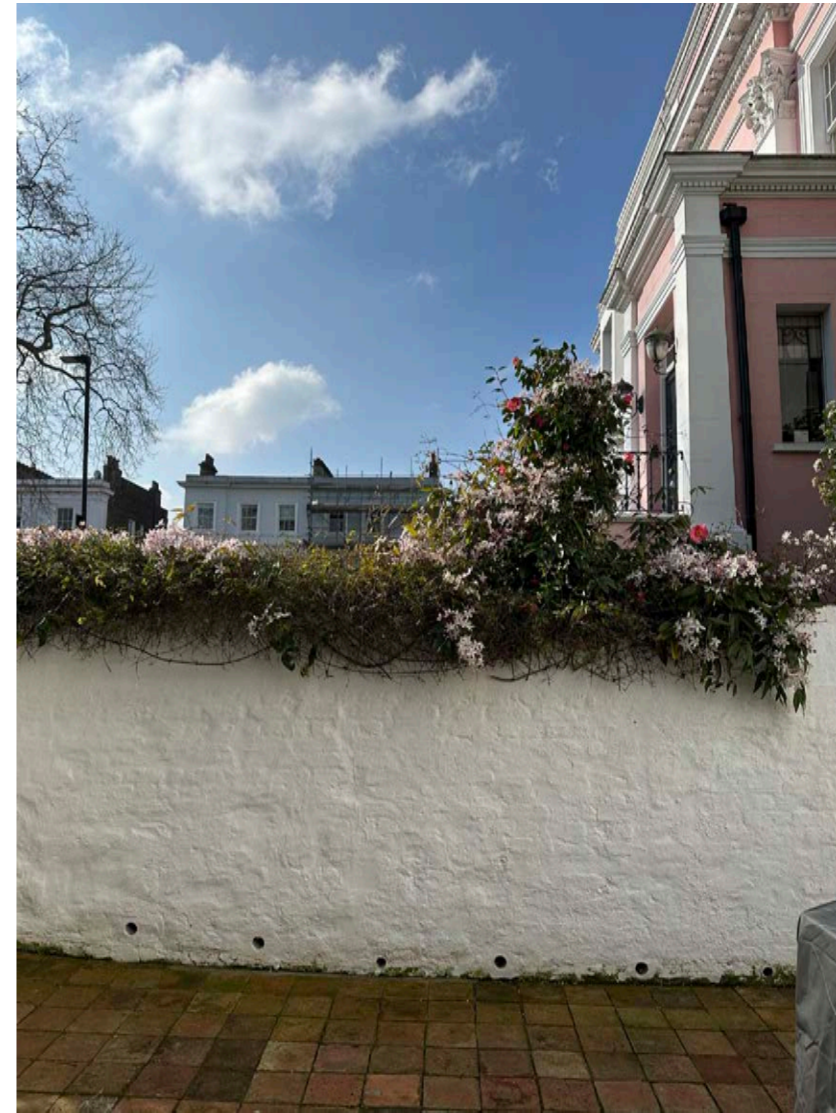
Portion of existing brick wall proposed to contain new bin and bike store
